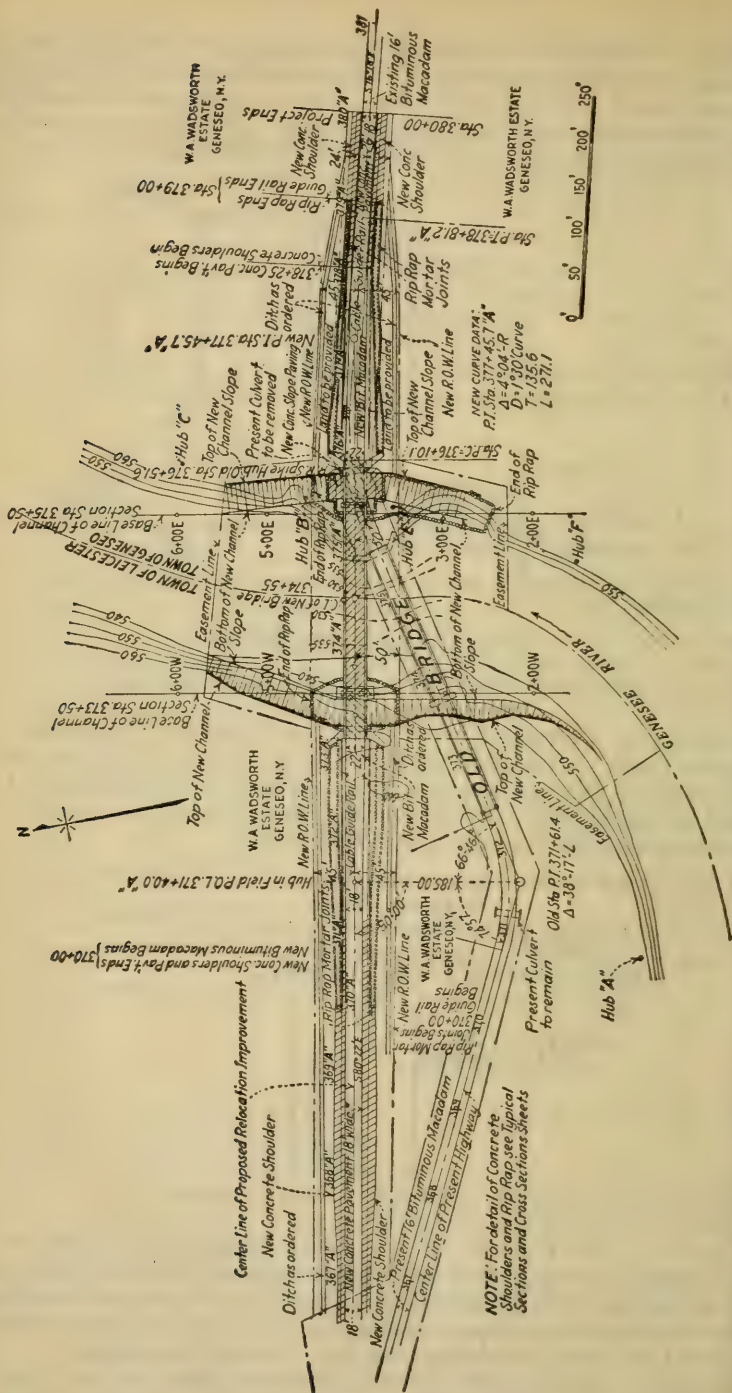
General layout bridge No. 5 road 1247. Showing improved road approach alignment, short right angle span and channel improvement.
